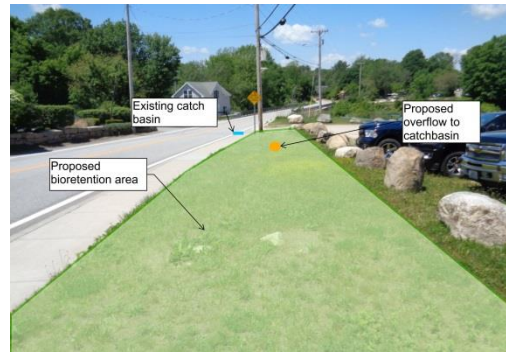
View of proposed bioretention area. Overflow would be to existing catch basin on Bridge St.
